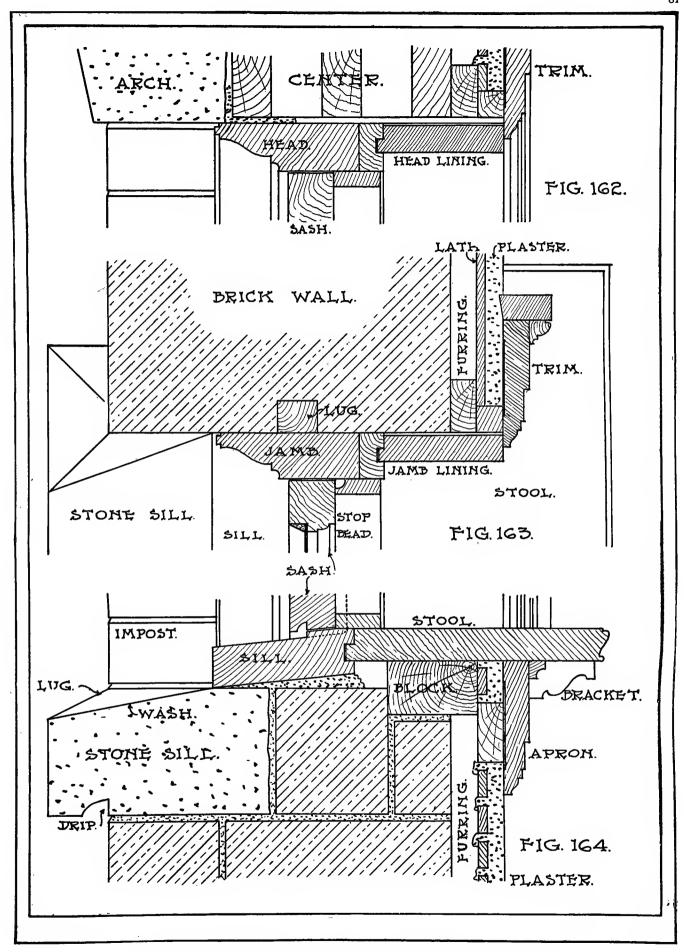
INEXPENSIVE CASEMENT IN BRICK WALL
